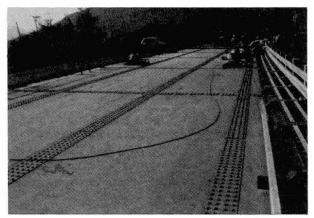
Replacement works of damaged RC decks to prefabricated steel bridge deck
